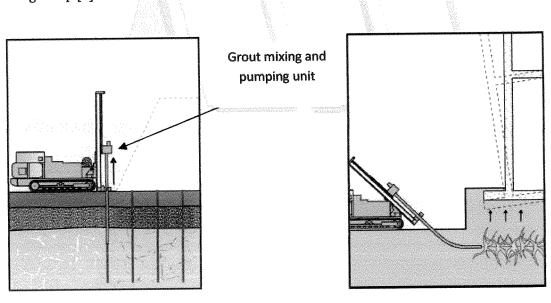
Schematic of Grout mixing and structural integrity fully restored [3]
